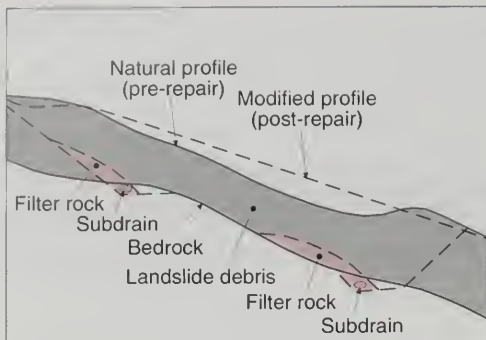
Recommended subdrain installation key detail included in plans and specifications (Courtesy of HDR).
